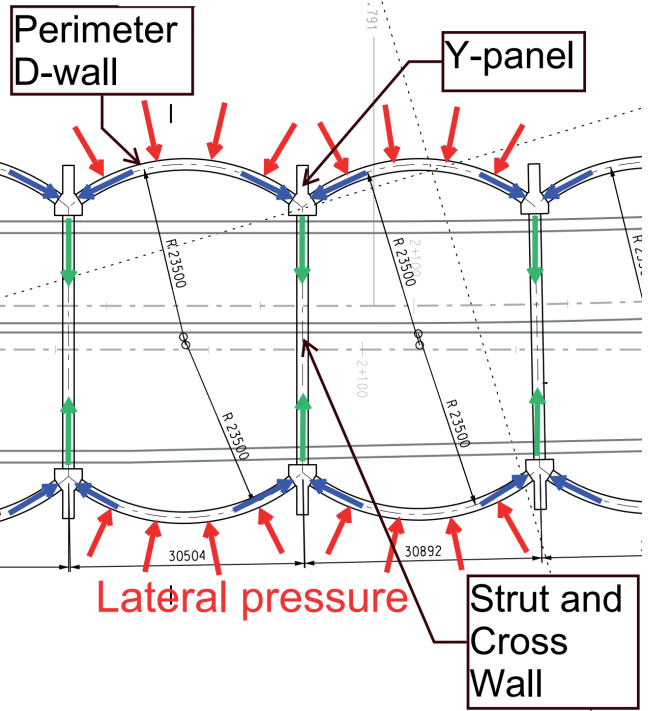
Typical arrangement of Caterpillar cells and load transfer
